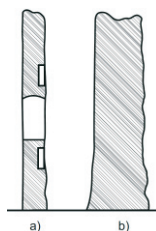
The division of walls with respect to thickness: a) a thin wall, b) a thick wall
